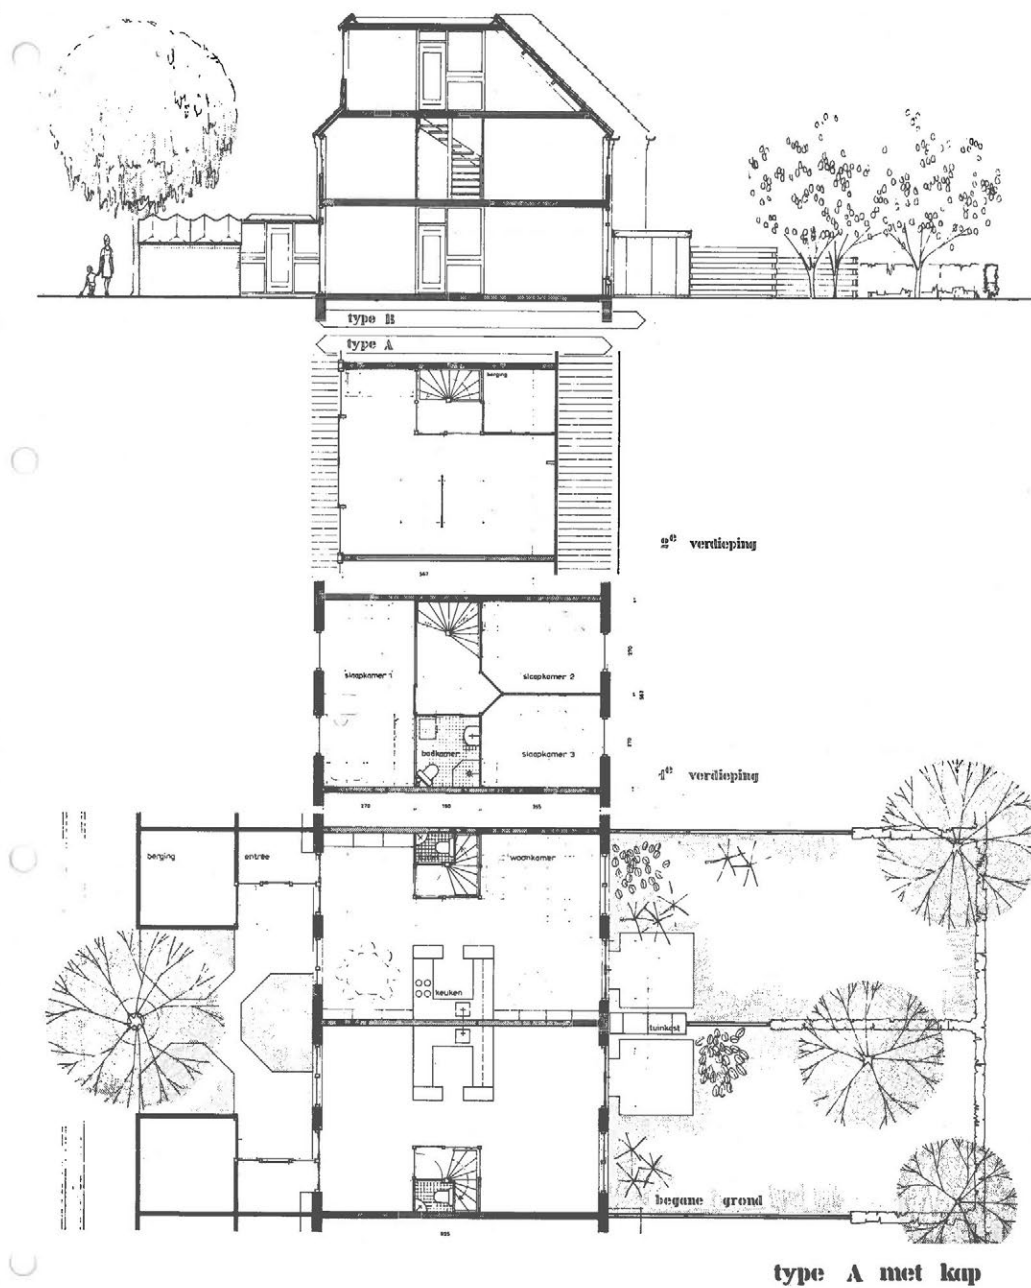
Typical section and floor plan, Van Stigt, De Werven, Almere Haven, HNI archive, 1977
